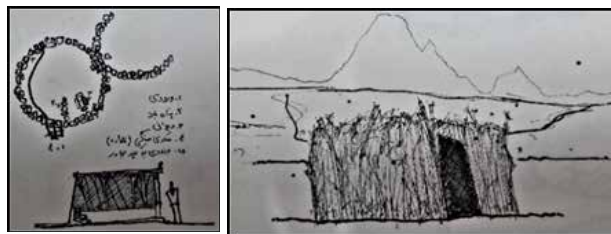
Perspective, plan, and cross-section of a Kepar²⁰
